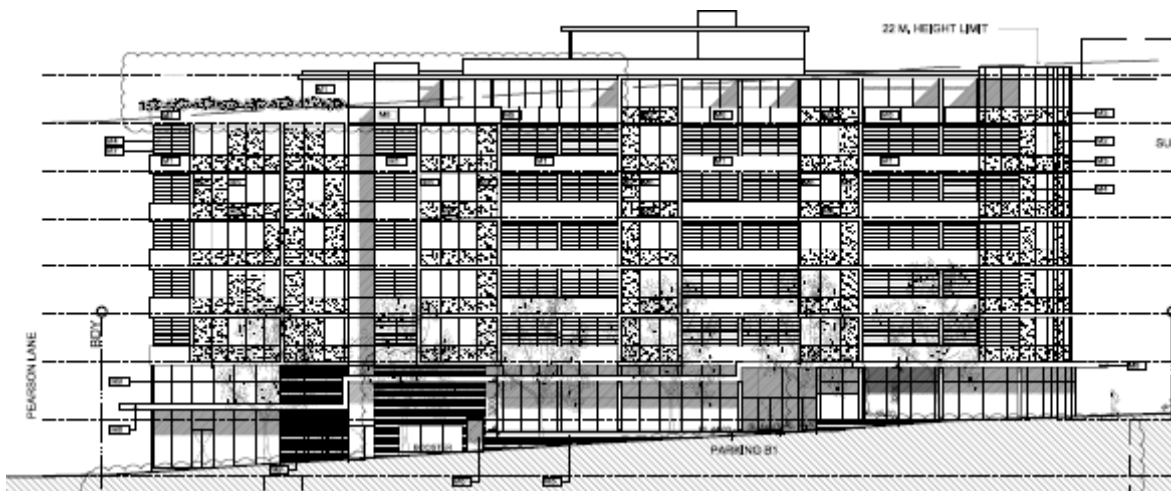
North-east elevation of Victoria Road showing the ground floor shopfronts.
